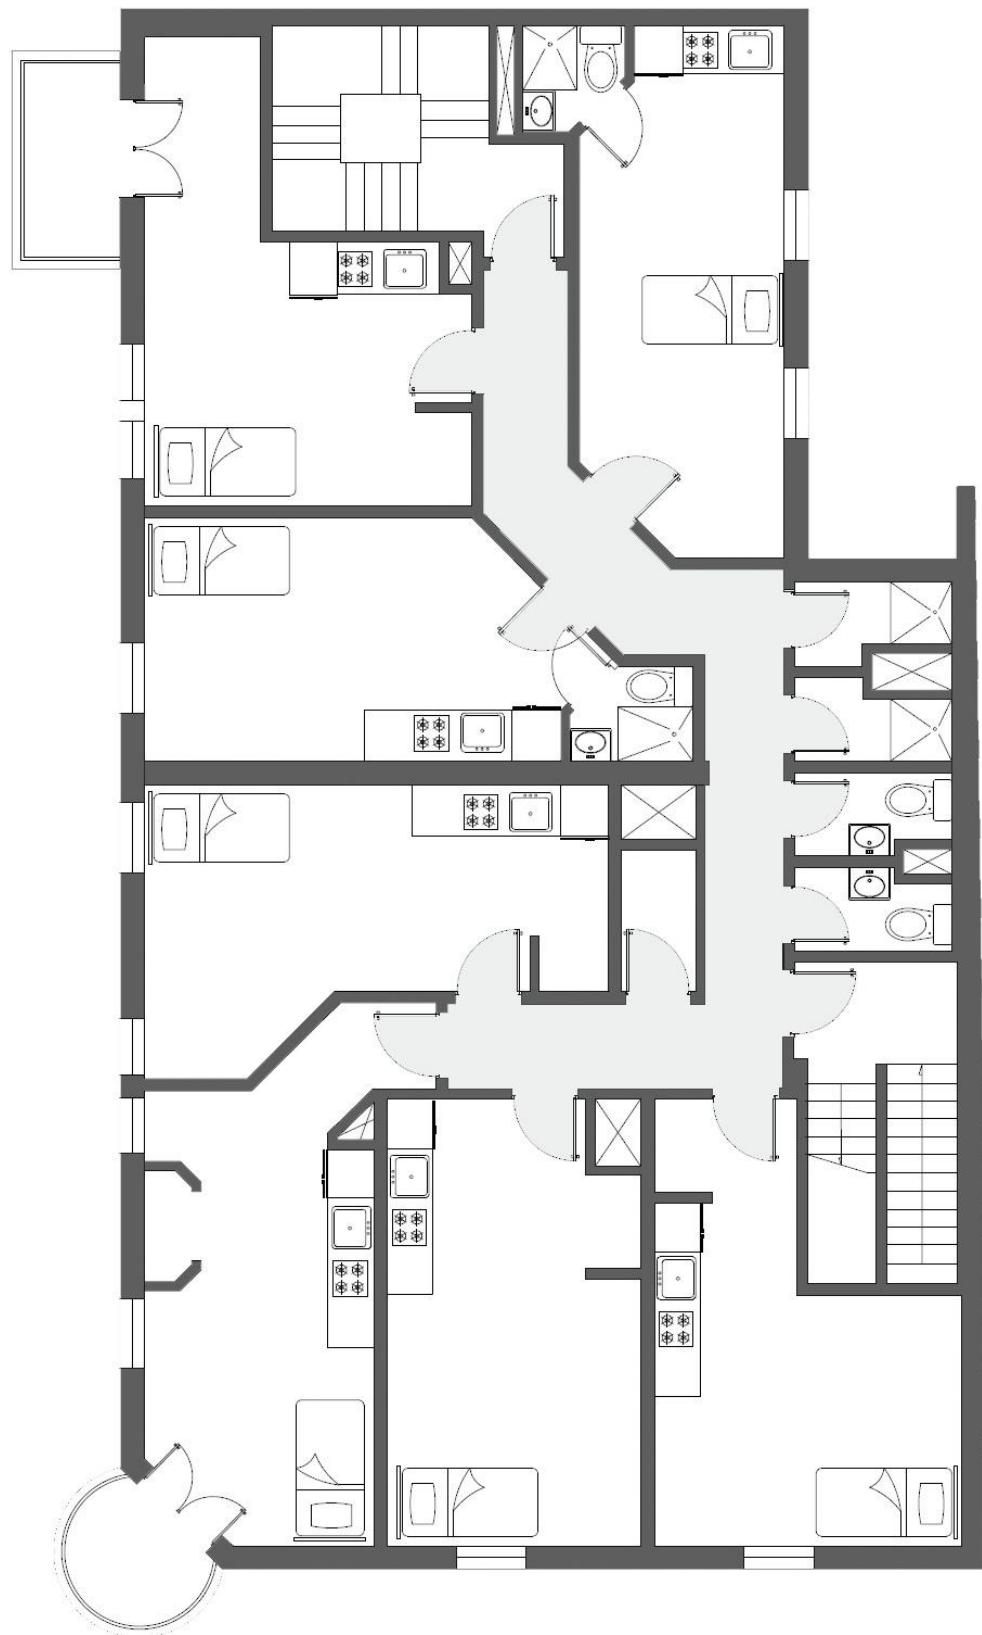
Second and third floor's layout – Aylwin's Rooming House. SCALE: 1:100
